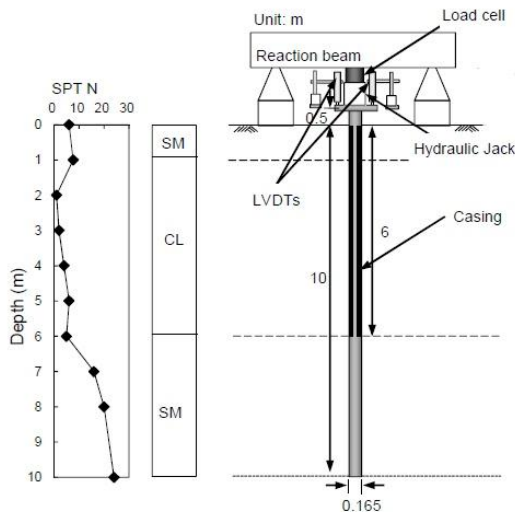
Full-scale field load tests at Gochang site (Kyung et al. 2017).
